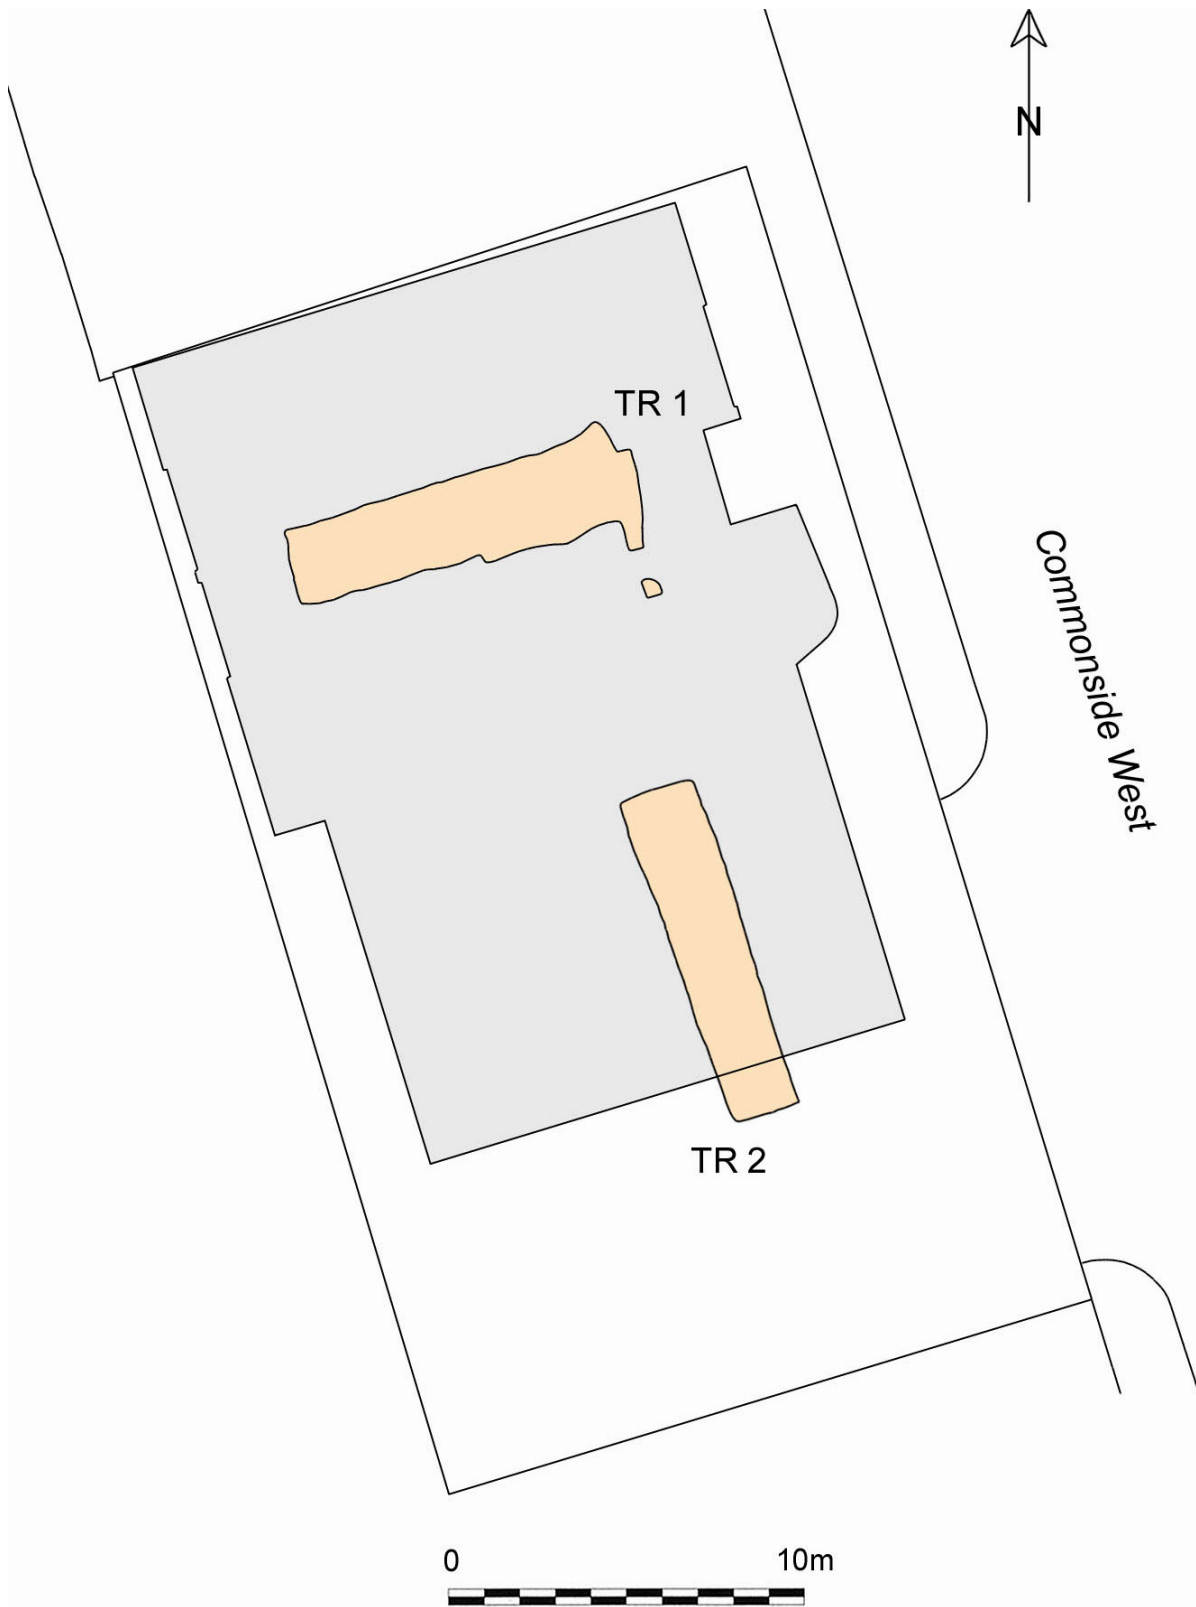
Plan showing the evaluation trenches (TR1 & 2) in relation to the new building footprint (shaded grey)
